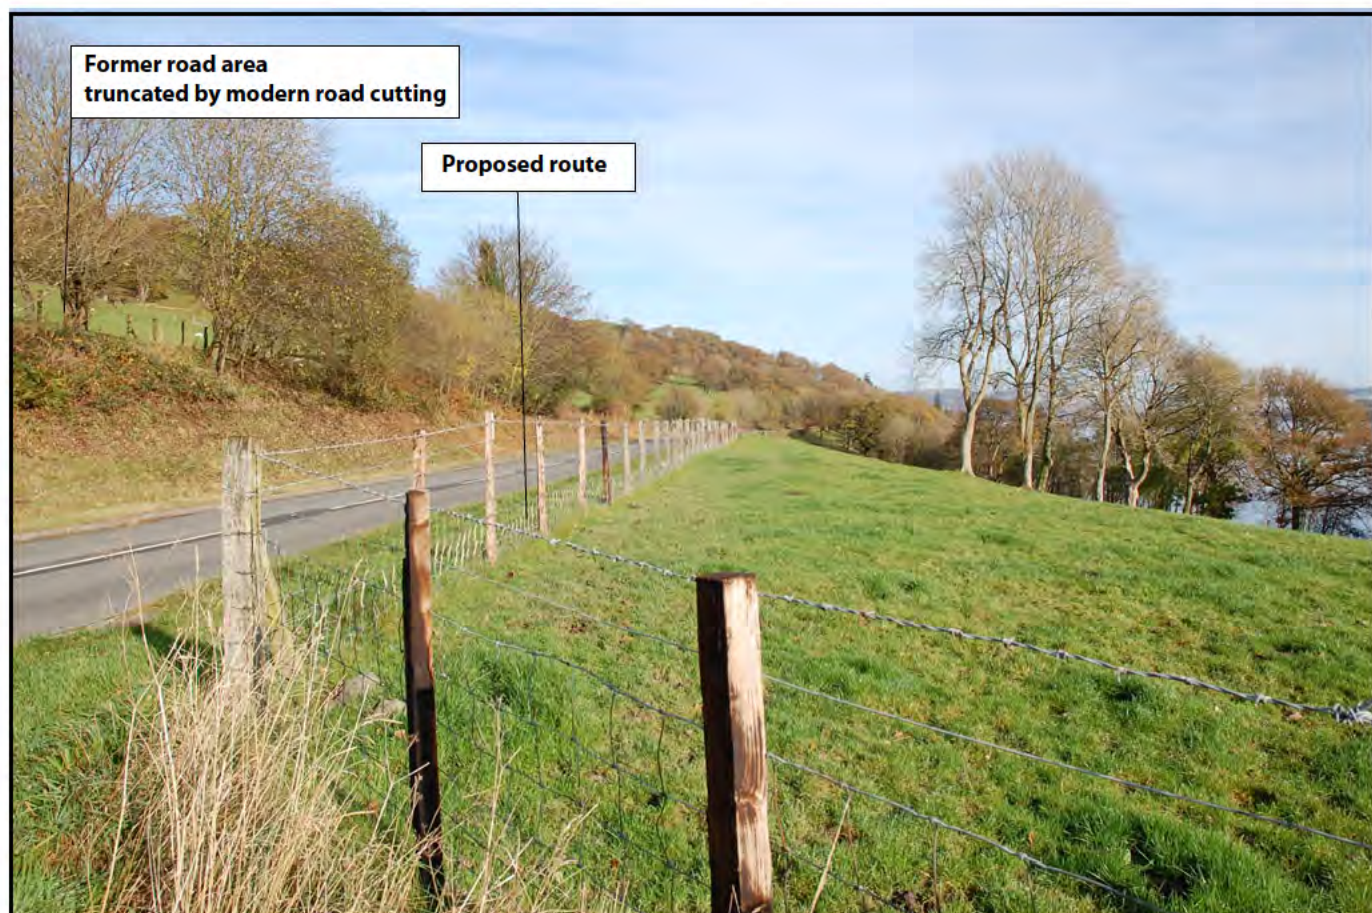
View north of the proposed cycle/footway, denoting proposed route and detailing modernised road.
